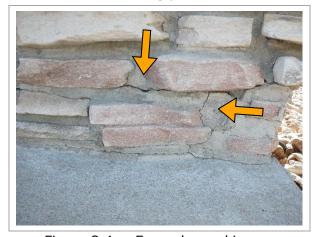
Example cracking on masonry wall covering.
